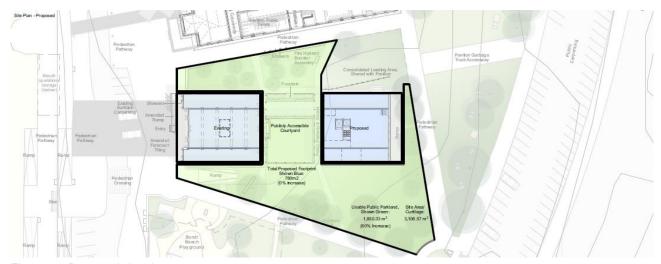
Proposed site plan. Source: Lockhart-Krause Architects, 2021
